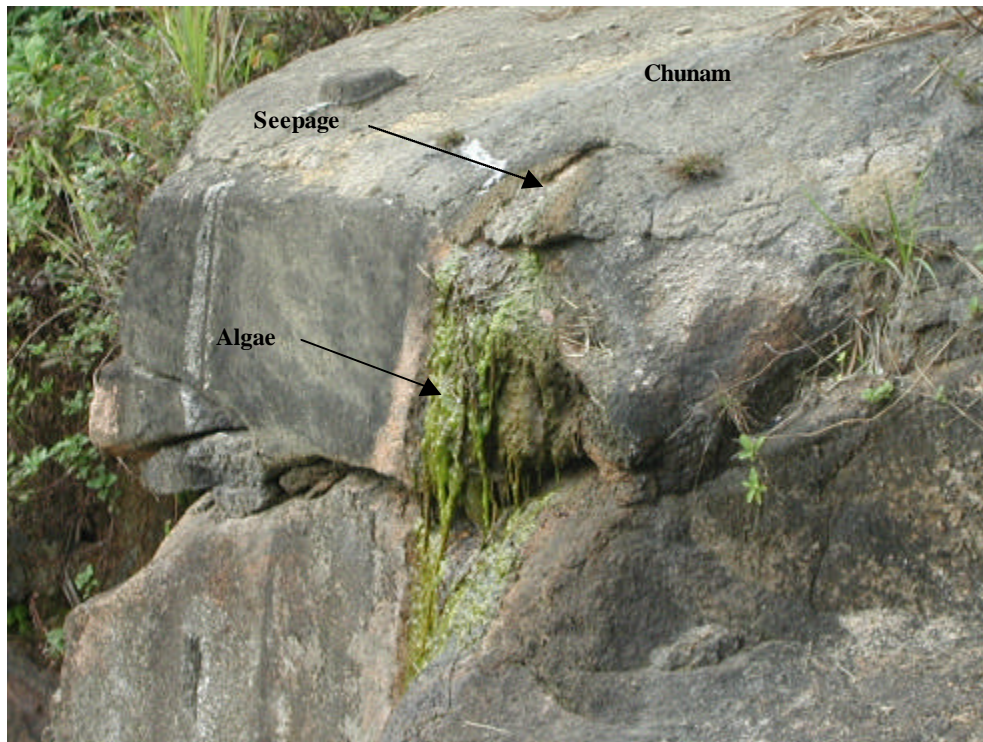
Detailed View Showing Seepage between Chunam and Rock Interface
